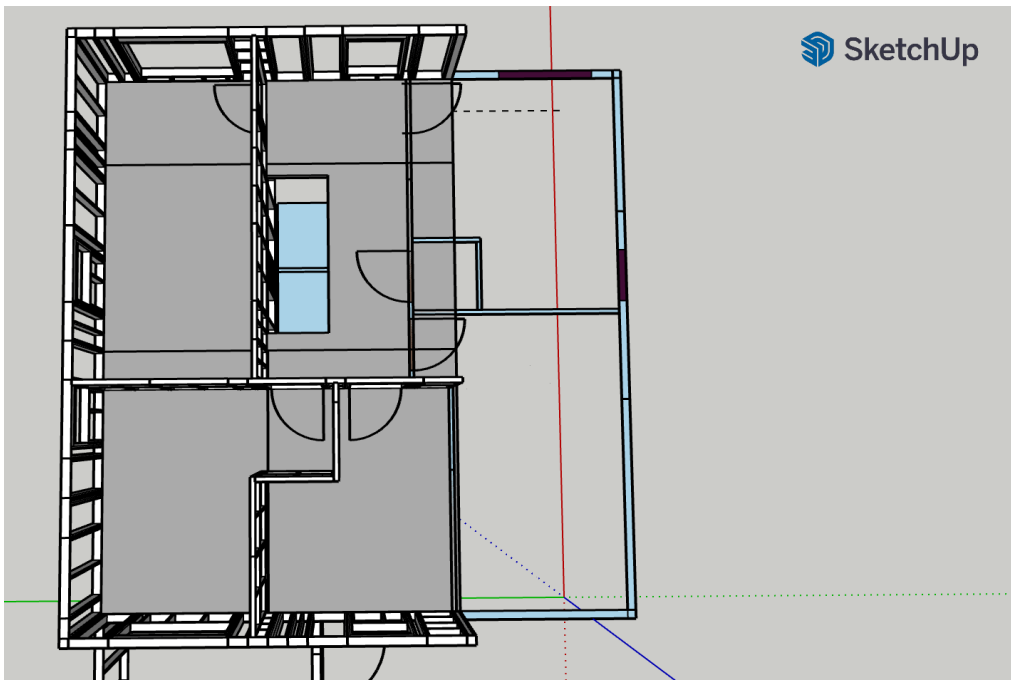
First Floor wall layout in smaller version vs original size. Some internal walls are removed. Ecor is added to the leftmost wall panels but the rest of the “left” replacement wall is not shown.
